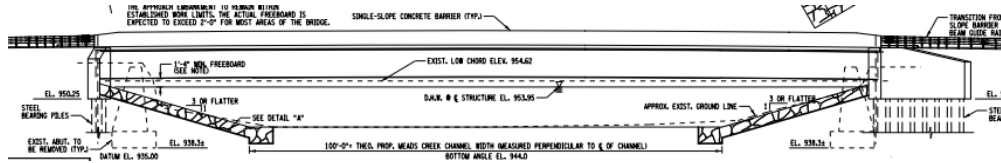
Elevation view of NY Route 415 bridge over Meads Creek
